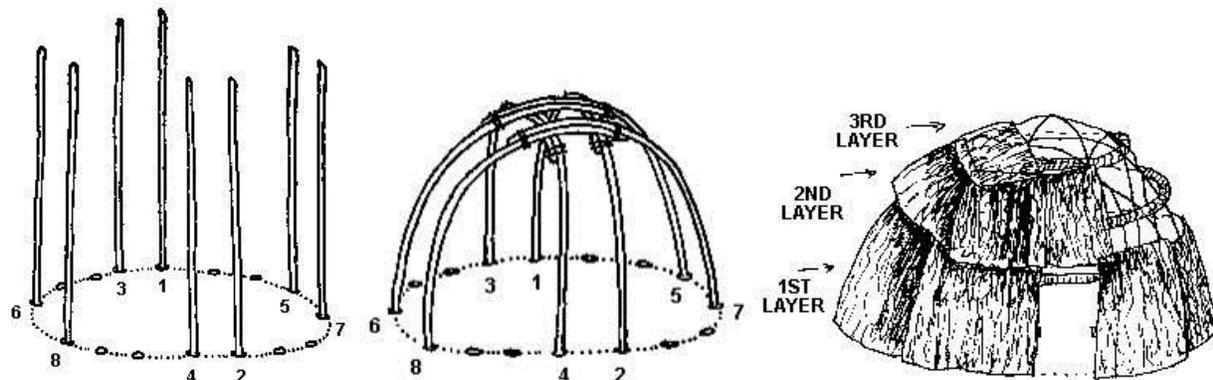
Process of building wigwam with sapling structure and layering of Birch bark
